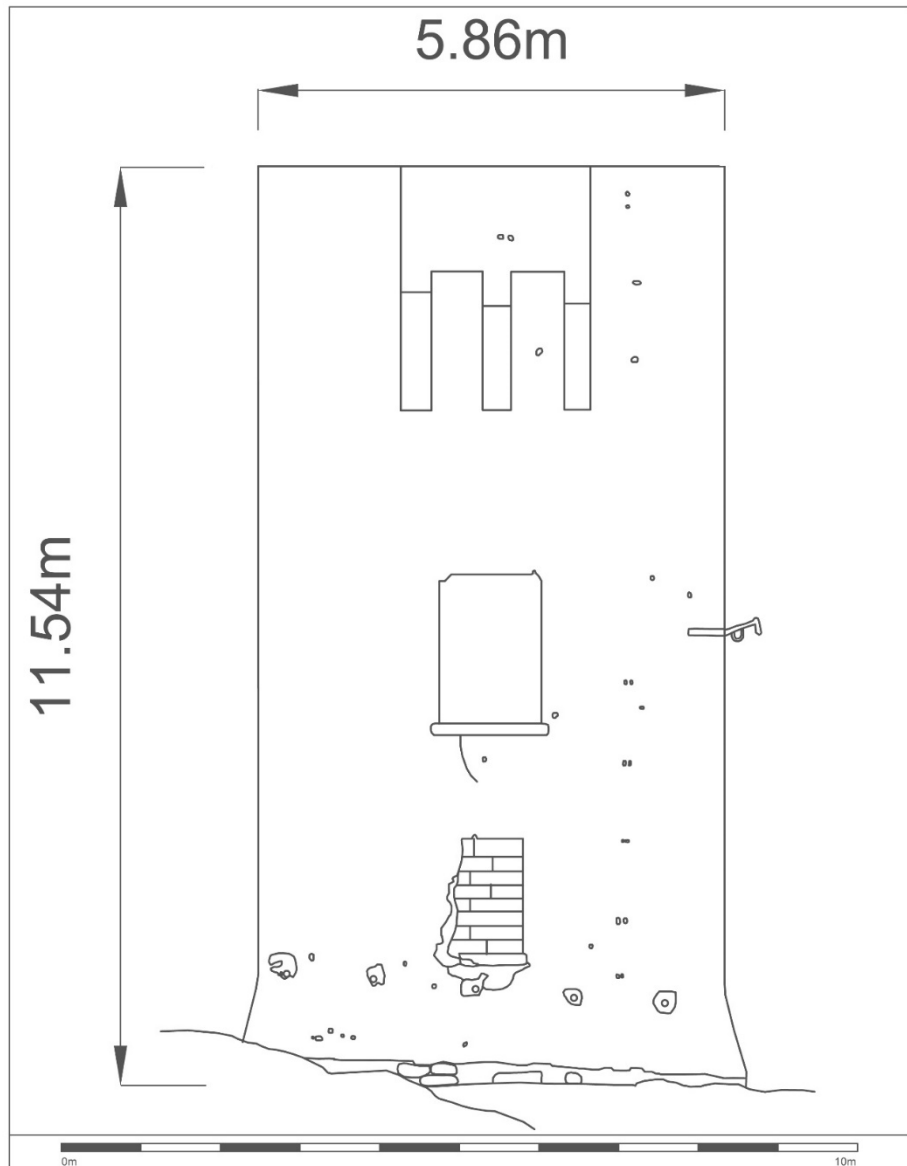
External elevation of the north-west wall of the heavily modified signal tower at Malin Head Signal Station.
